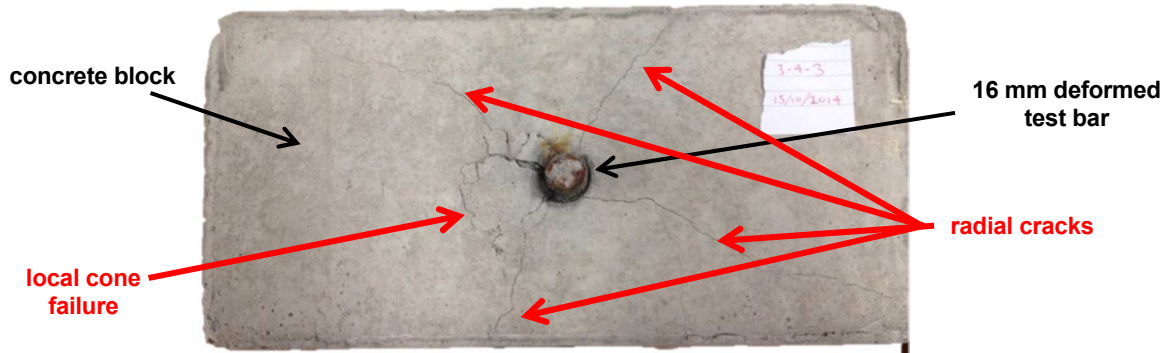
Plan view of specimen 3-4-3 showing a partial cone break-out failure and radial cracks.
